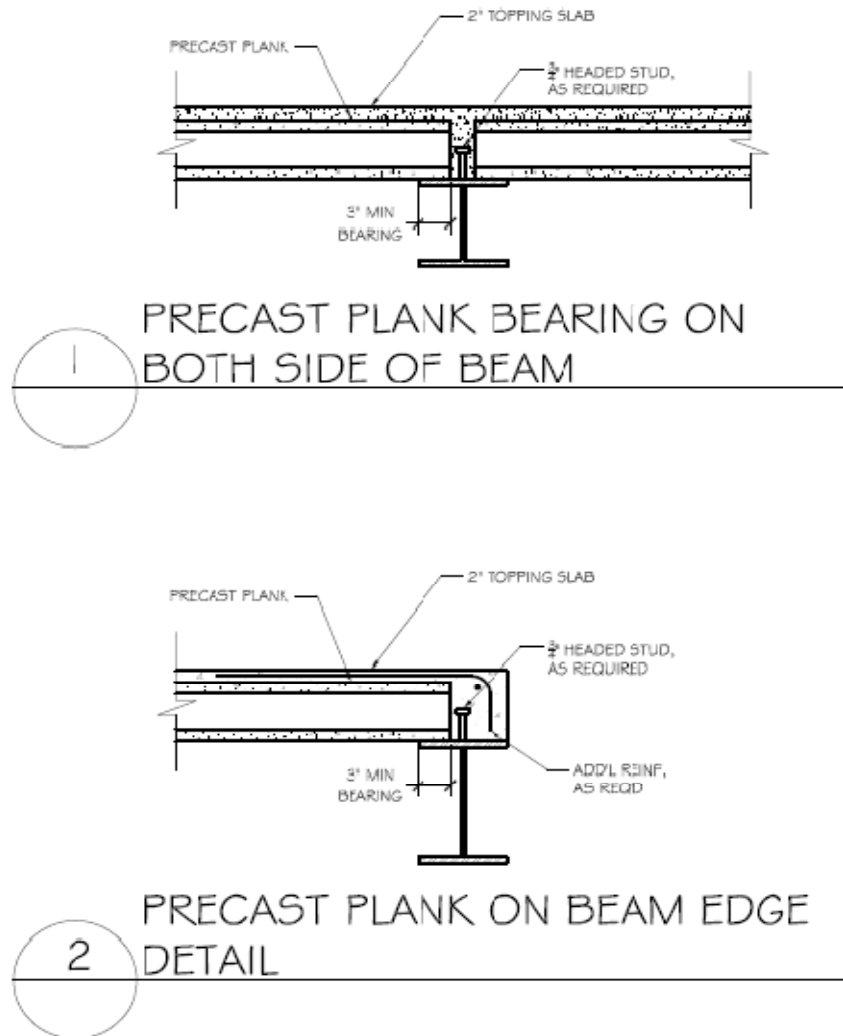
Non-Composite Steel Frame with Precast Plank Details
